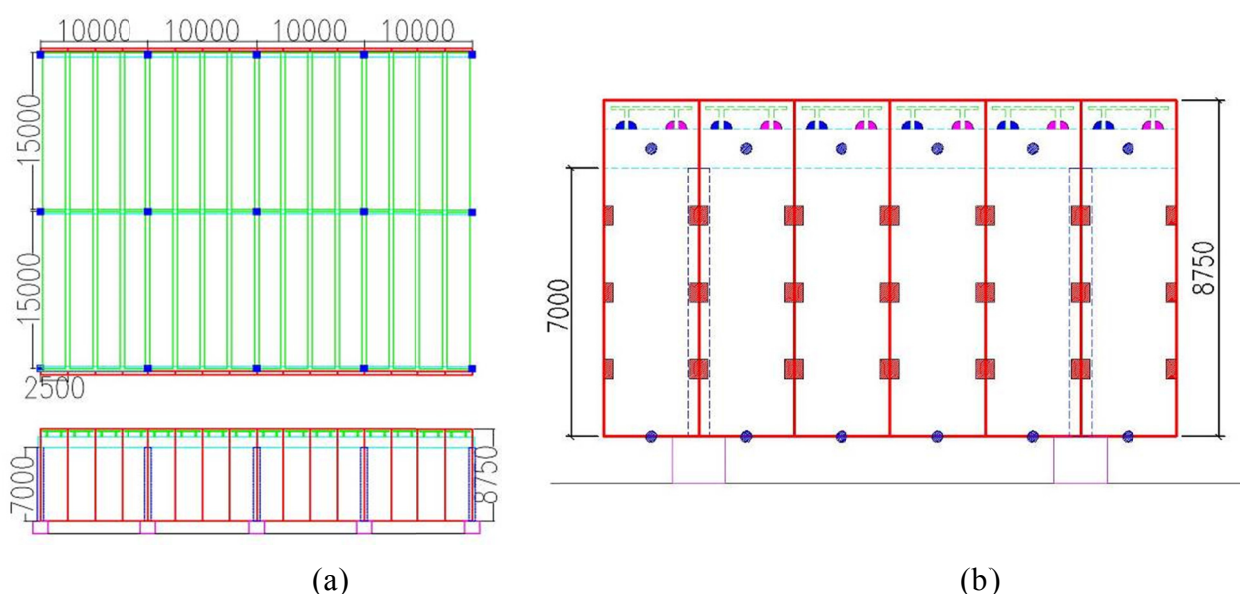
Precast industrial building prototype: a) plan and lateral view; b) particular lateral view with connection arrangement
